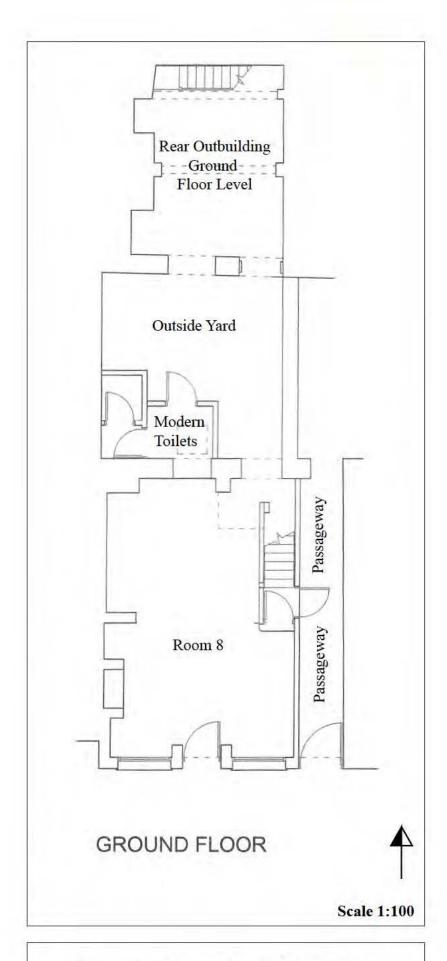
Architects Plan of 21 High Street Ground Floor Level. Plan Supplied by Client
